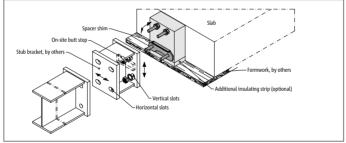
Usage of a stub bracket to overcome the facade thickness and to allow for horizontal and vertical tolerances
